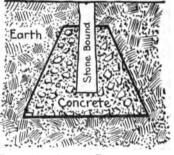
STONE BOUND WITH CONCRETE FOUNDATION.
